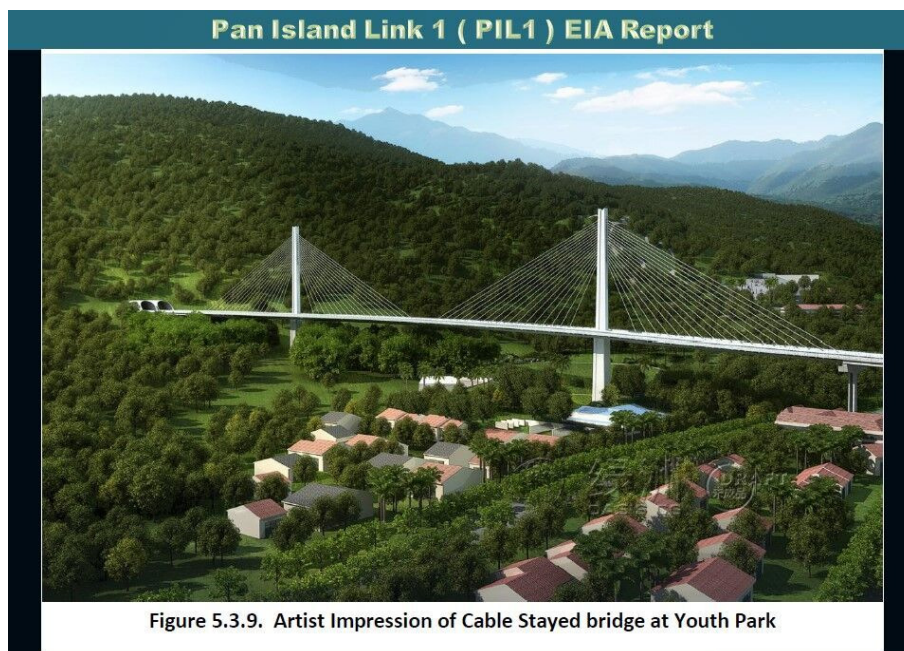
Proposed bridge spanning 500 metres over The Penang City Park (Youth Park)
